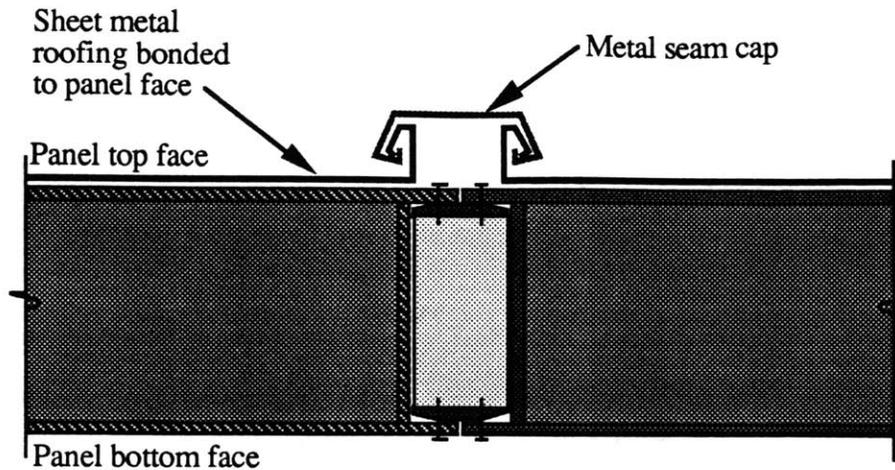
Seamed metal roofing on roof panels at panel-to-panel joint
